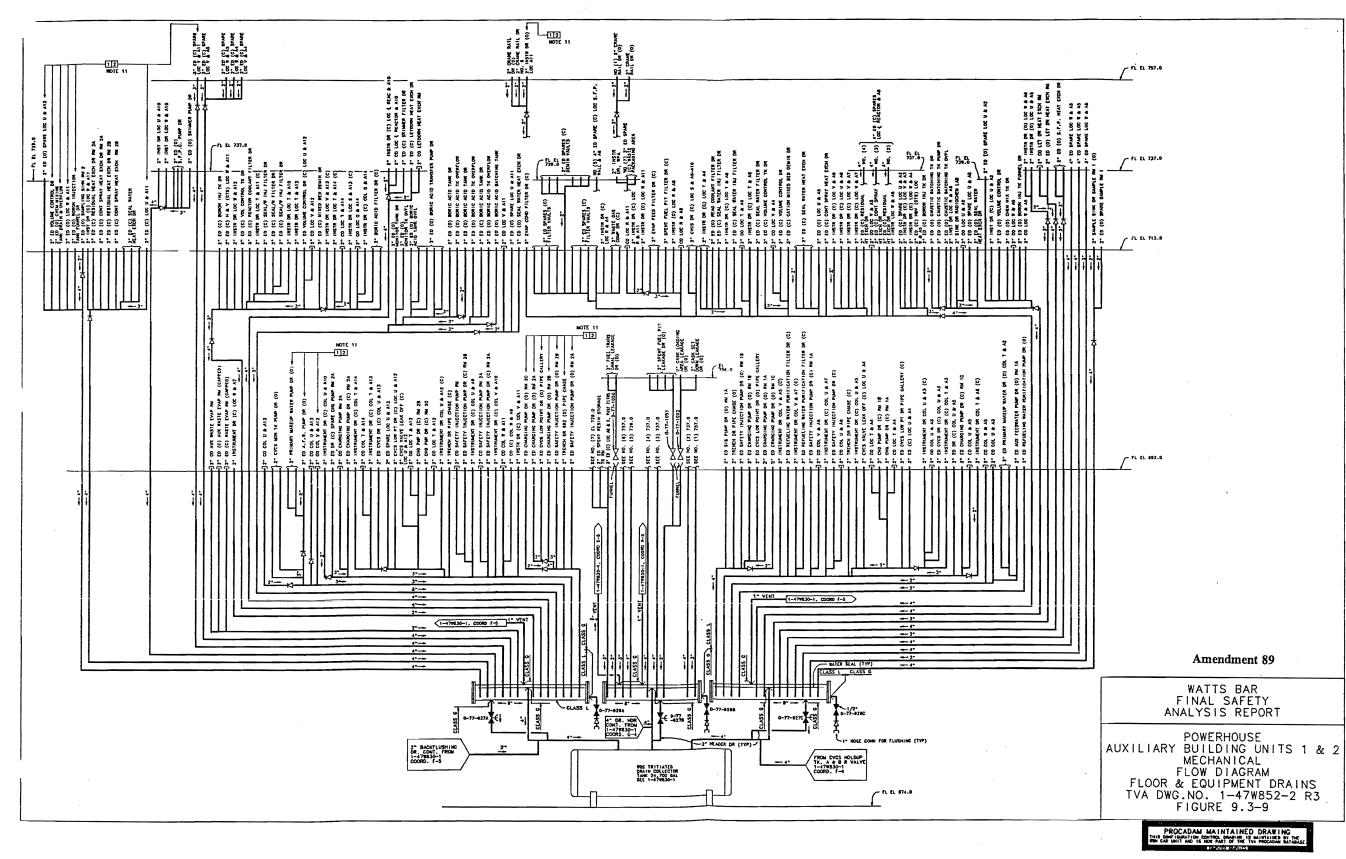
Powerhouse, Auxiliary Building Units 1 & 2 Mechanical Flow Diagram -Floor and Equipment Drains
